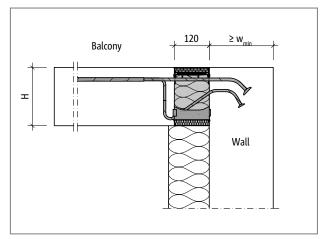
Schöck Isokorb® XT type K-O: Wall connection downwards with external insulation
